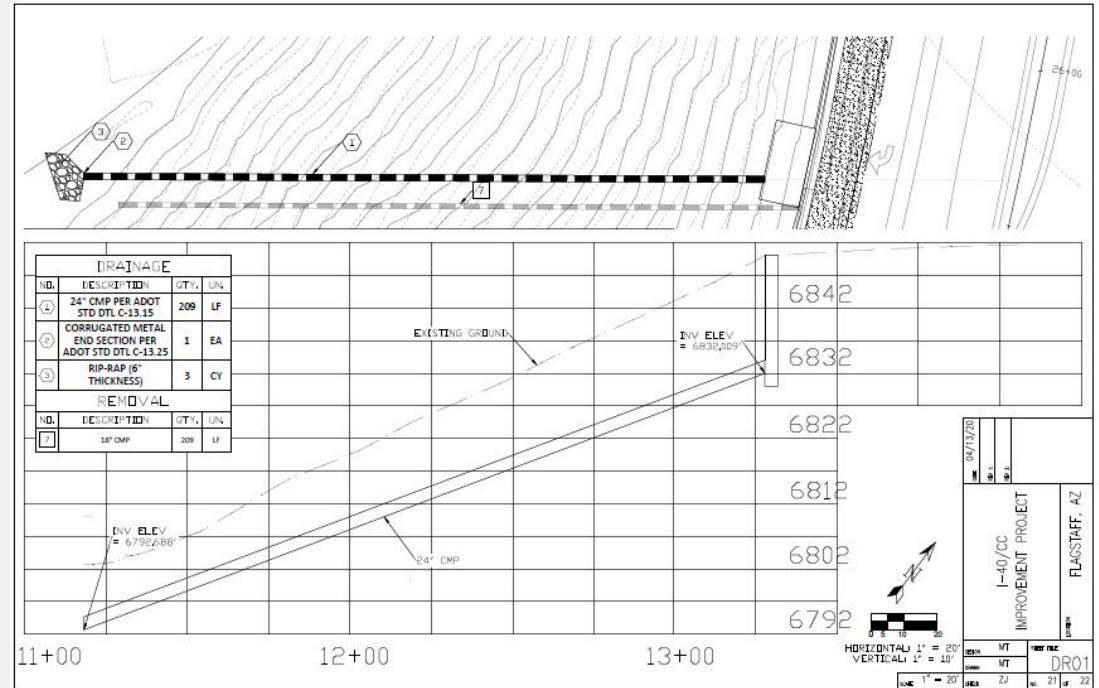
Storm Drain Pipe Plan Sheet Profile (NTS)
